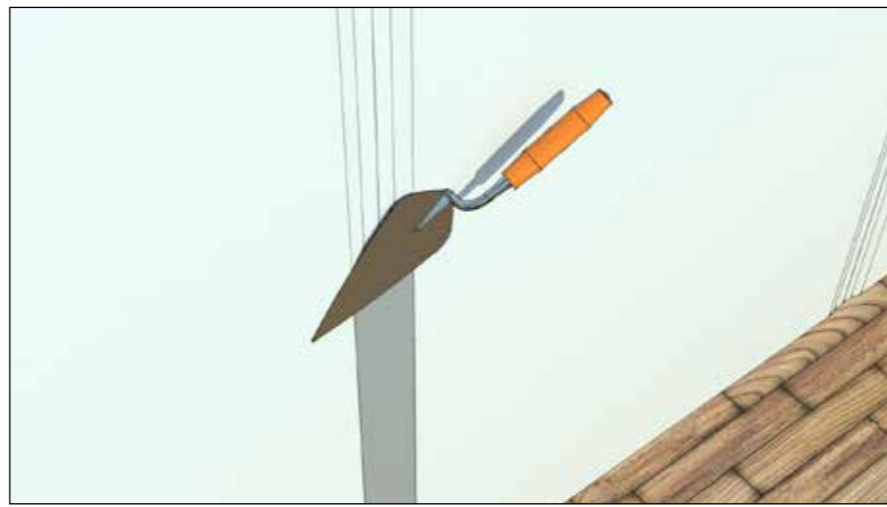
Taping and Filling Joints in Spacetherm Multi / Spacetherm A2 Multi
